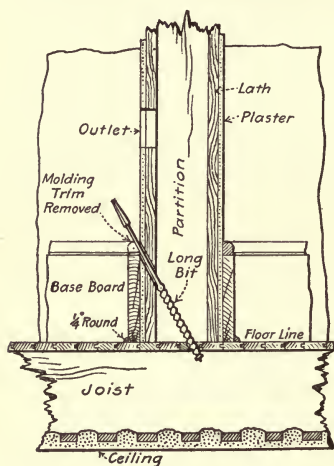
Method of wiring from a partition outlet to a ceiling outlet or a pocket without disturbing baseboard or floor.
